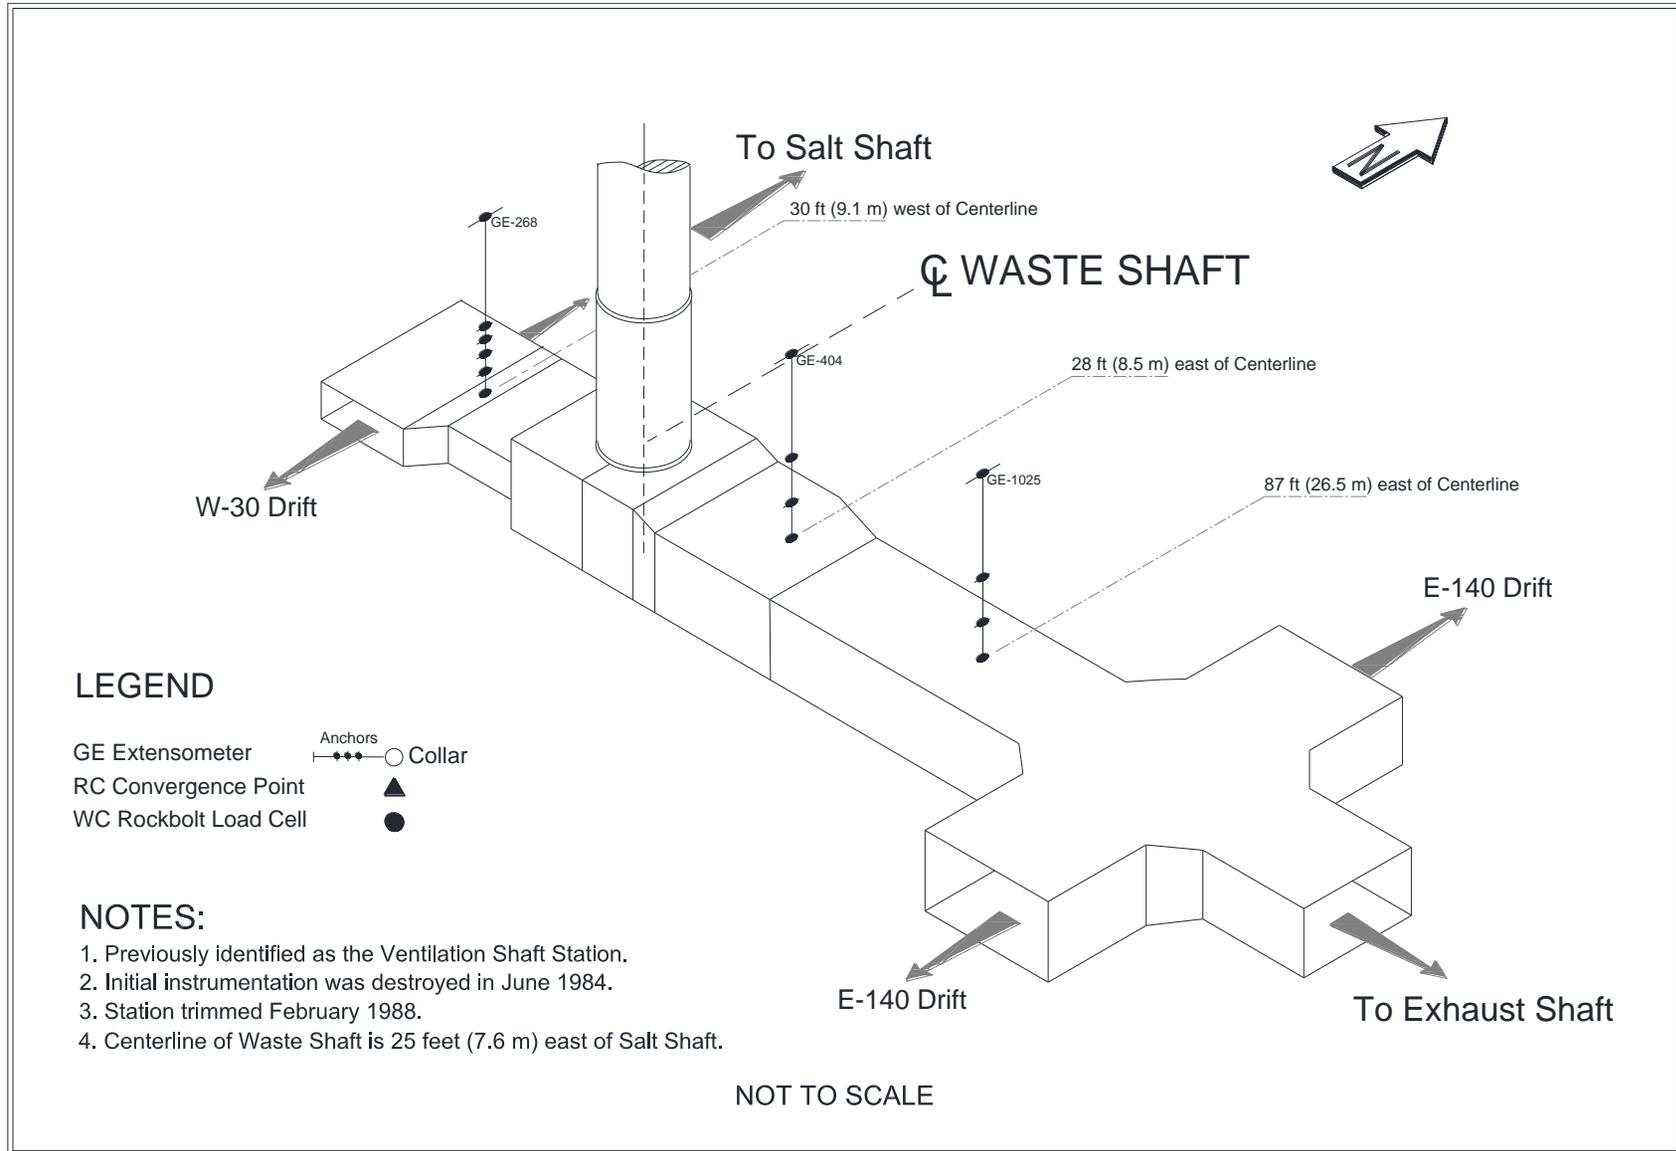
Waste Shaft Station Instrumentation after Roof Beam Excavation
